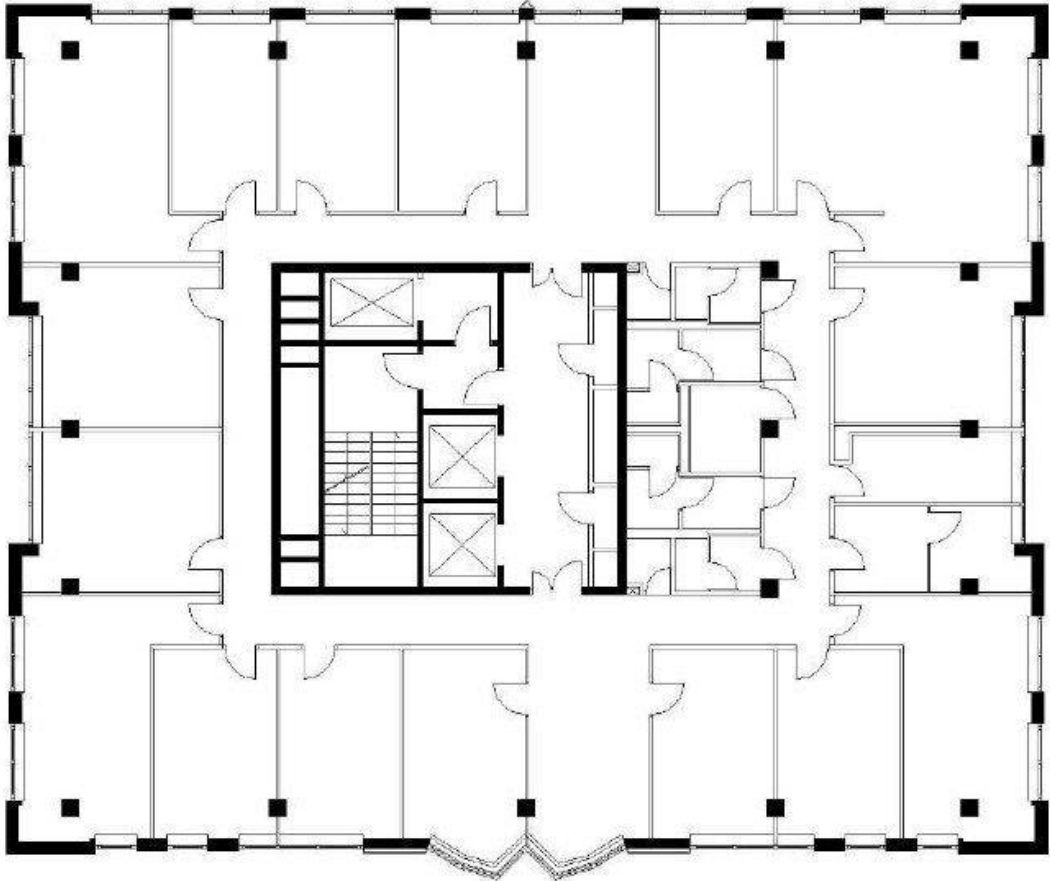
One more example of typical floor plan is reported: Eureka tower in Warsaw.
